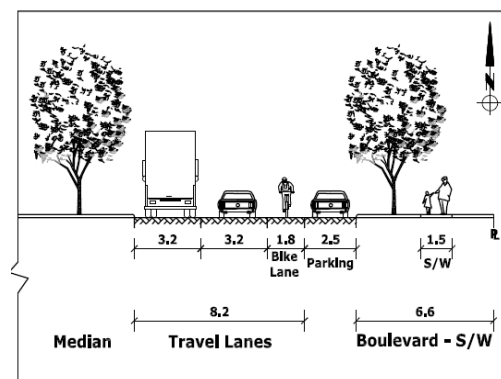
49<sup>th</sup> to 33<sup>rd</sup> Avenue - Recommended Typical Configuration for East Carriageway
